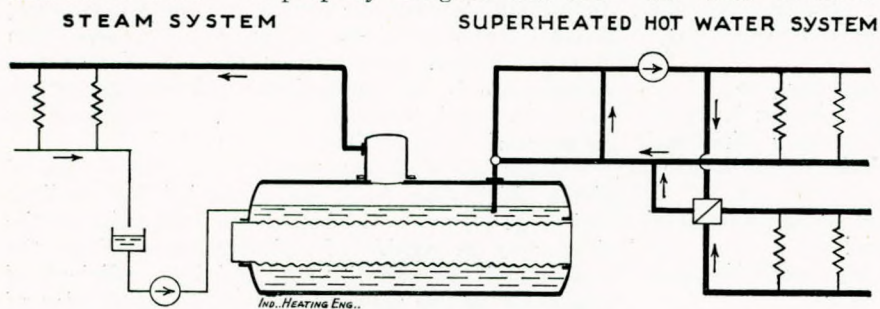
Steam and superheated hot-water supply from a steam boiler.
